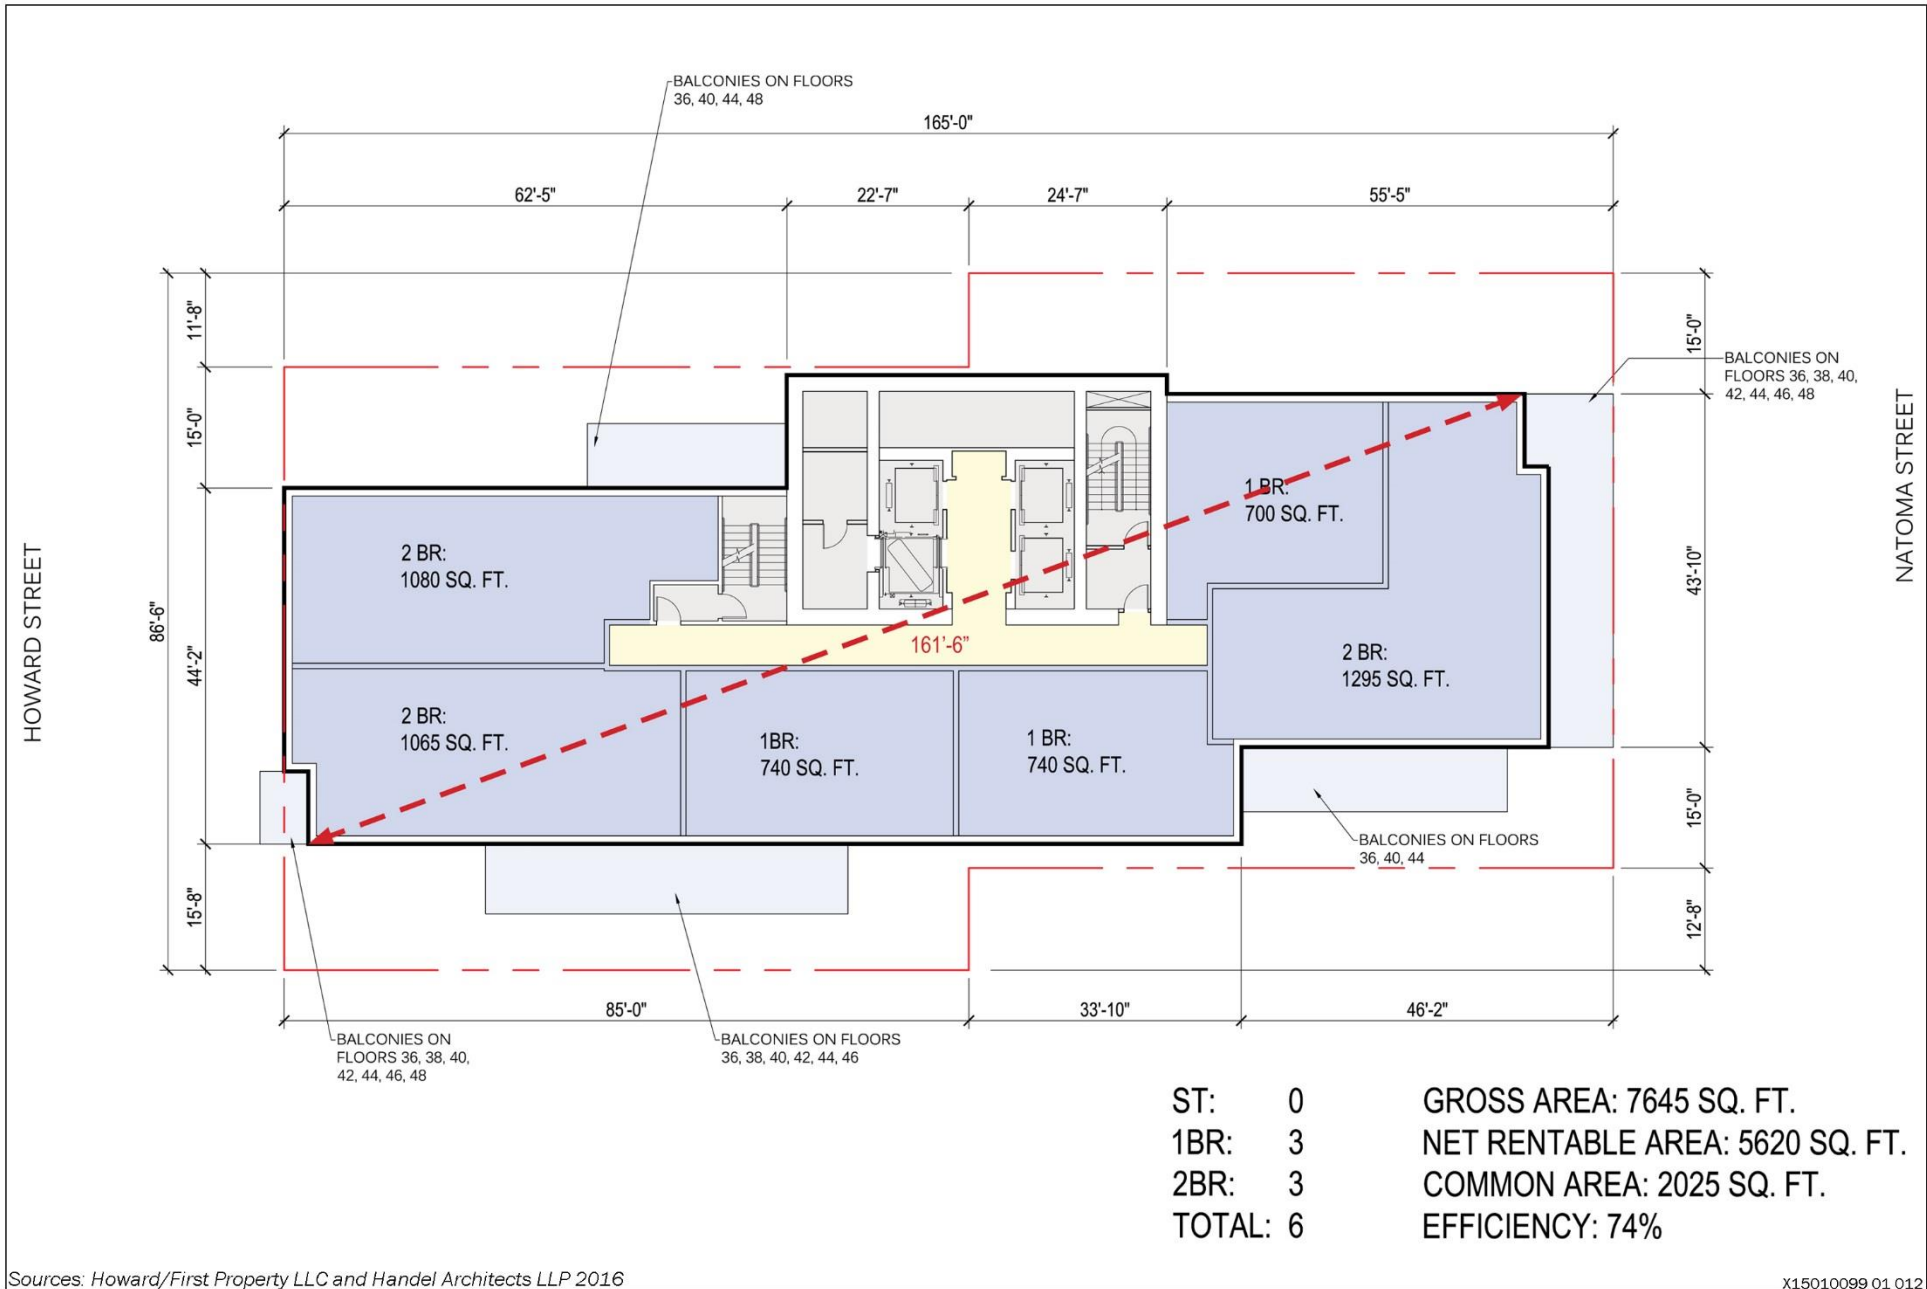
Conceptual Residential Floor Plan (Floors 36 through 48)
